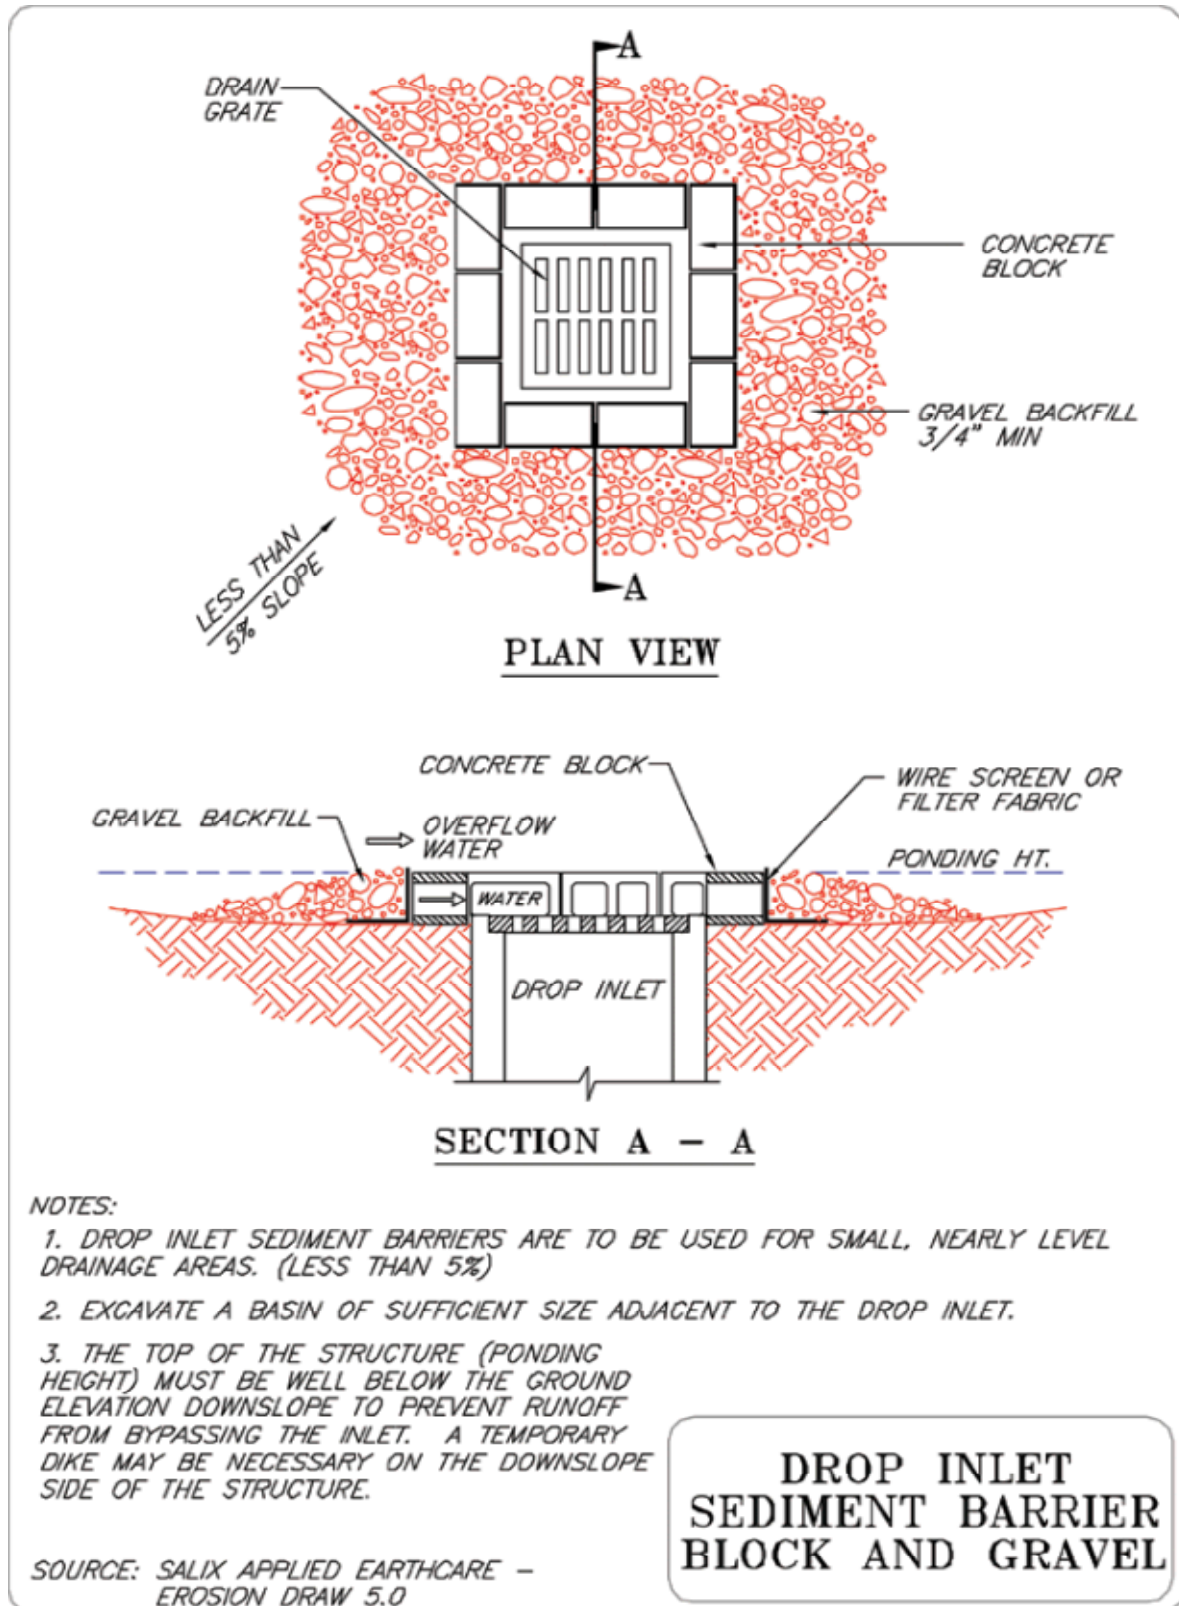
Block and Gravel Drop Inlet Protection
